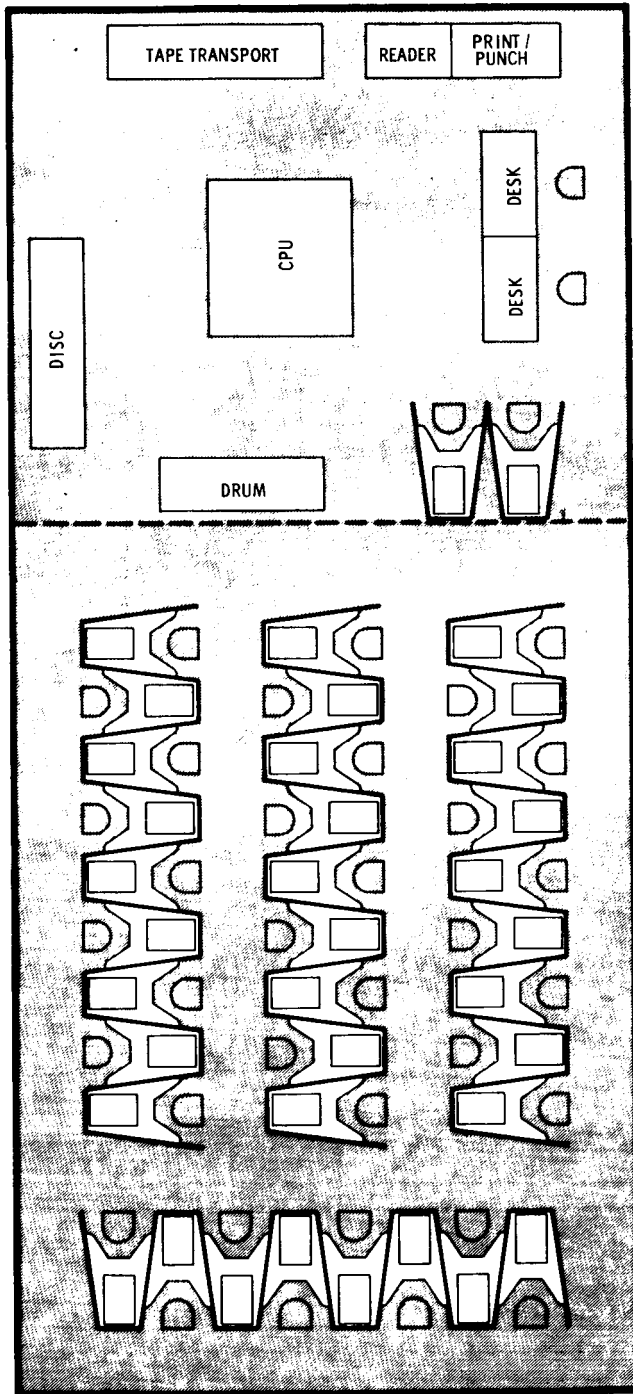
Typical Floor Plan Layout for Optimum CAI System for Flight Control Applications (Artist's Conception)
